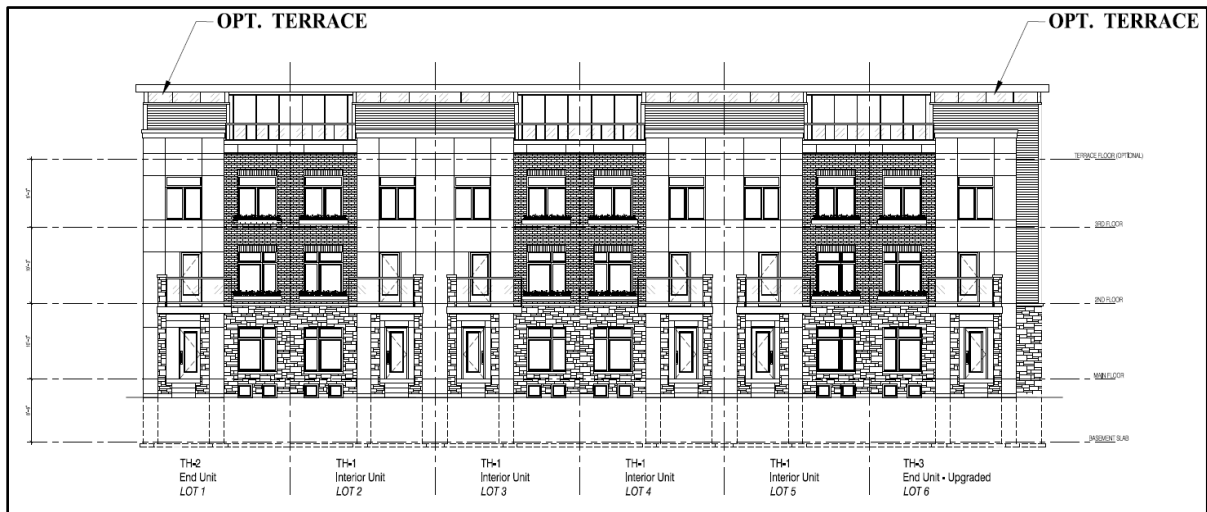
PROPOSED BUILDING ELEVATIONS PREPARED BY JARDIN DESIGN
